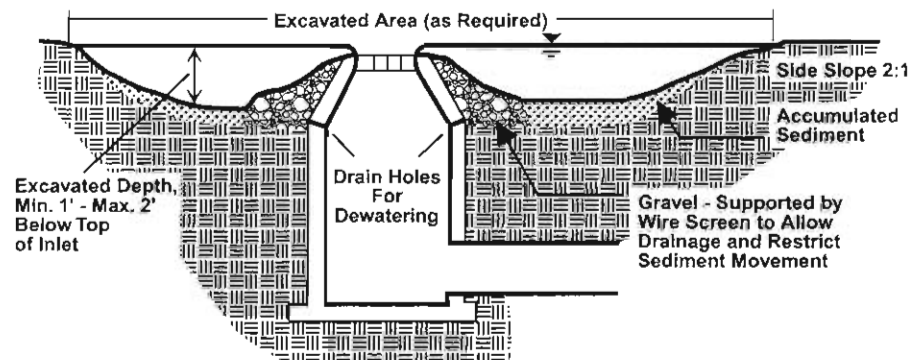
Cross section of Excavated Drop Inlet Protection
